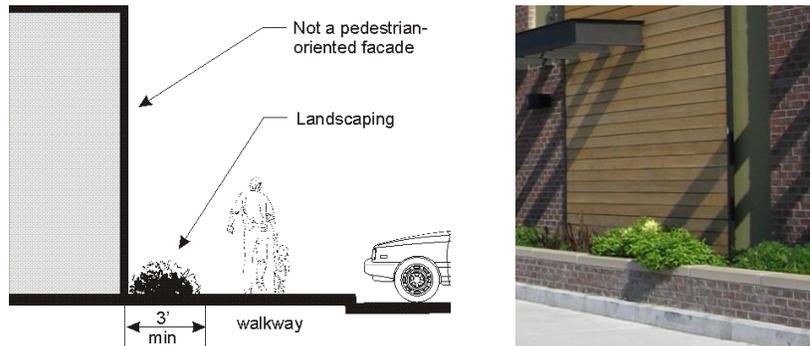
B.30.210a. Provide landscaping between walkways and buildings that do not comply with pedestrian-oriented façade requirements.
